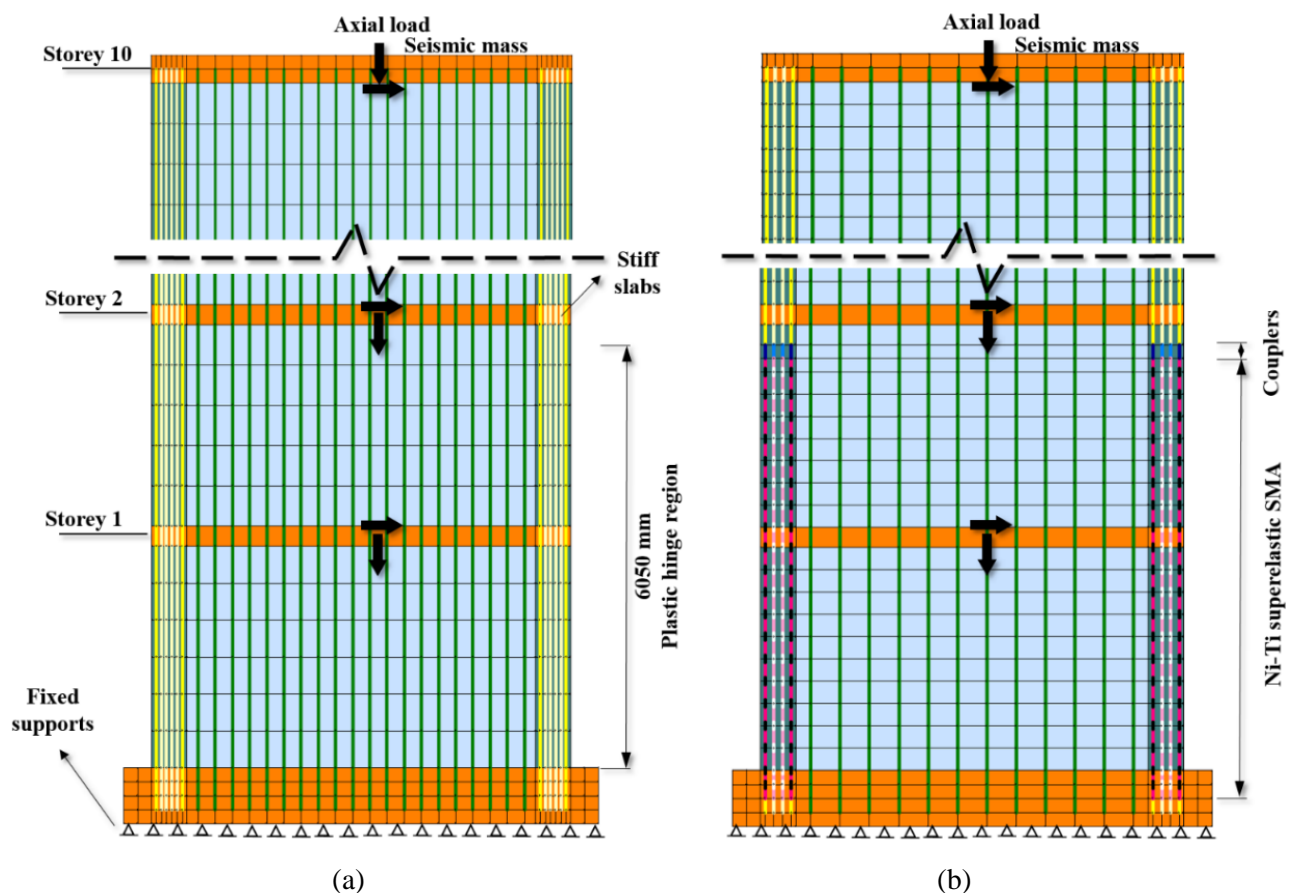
Finite element models: (a) Wall DSRW and (b) Wall MDHW
